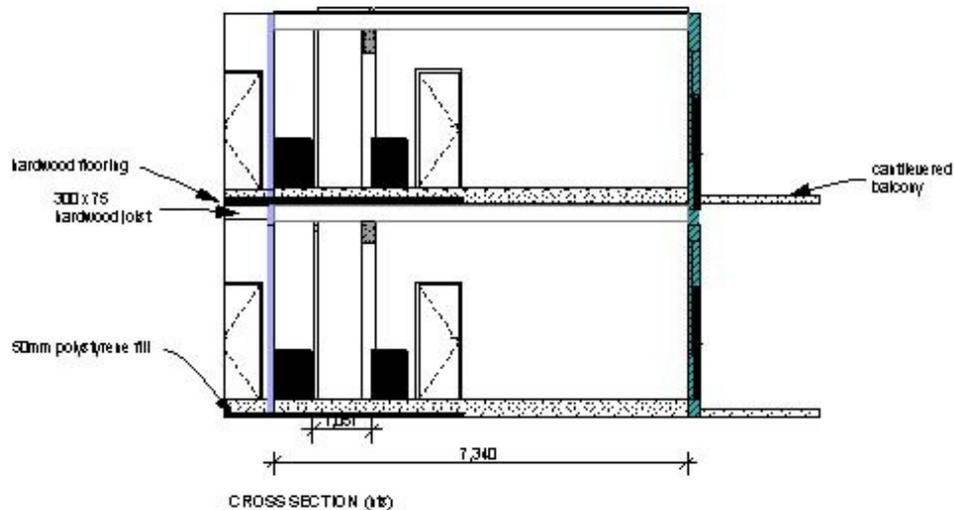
CROSS SECTION THROUGH STRUCTURE
